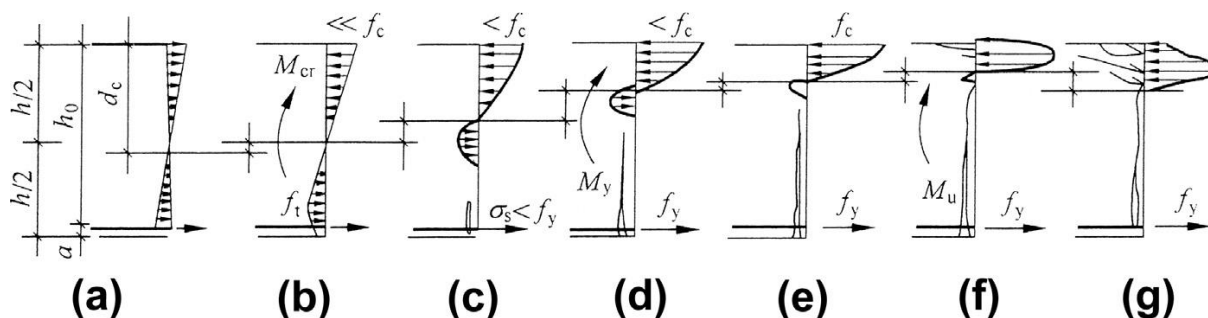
Developments of sectional stress and crack of beam: (a) before cracking, (b) just cracking, (c) after cracking, (d) yielding of reinforcement, (e) after yield, (f) ultimate state, (g) descending branch [64].
